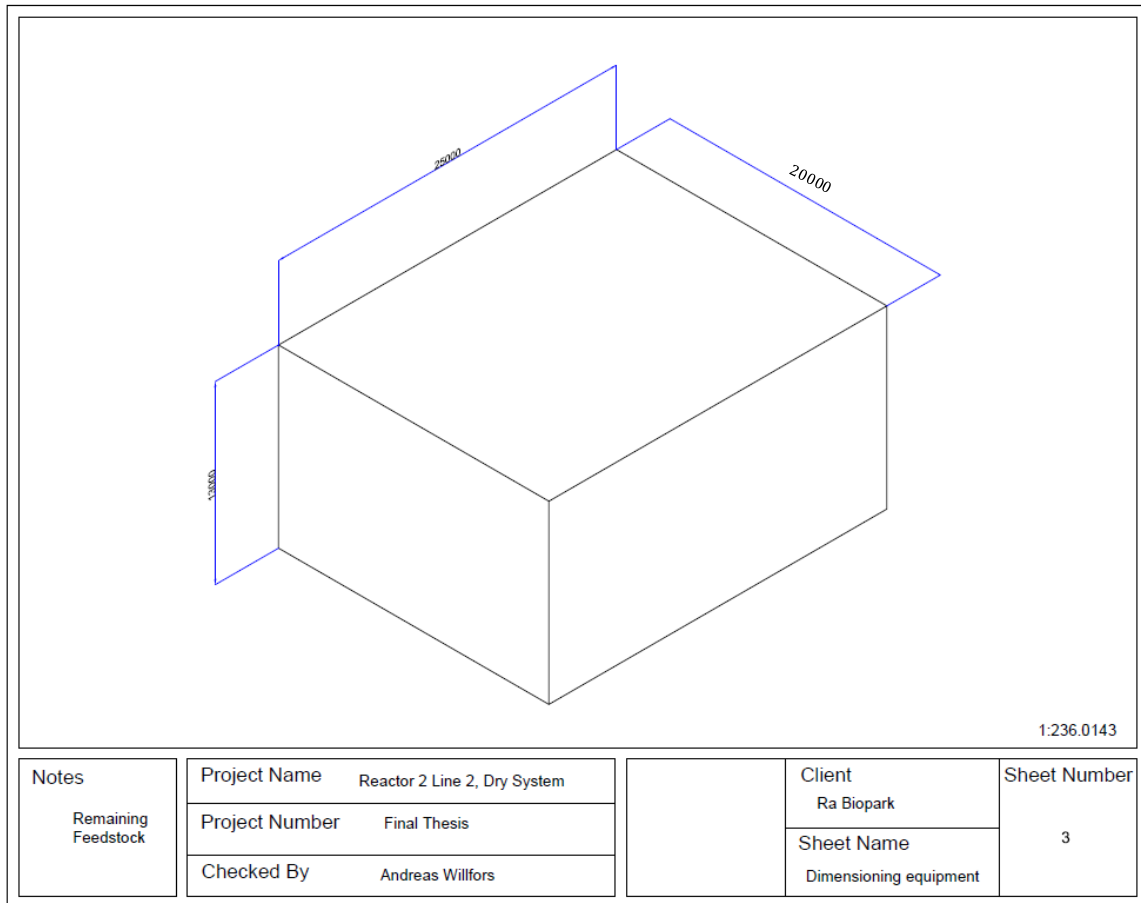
AutoCAD Layout Reactor 2 Dry system, (author's own)
